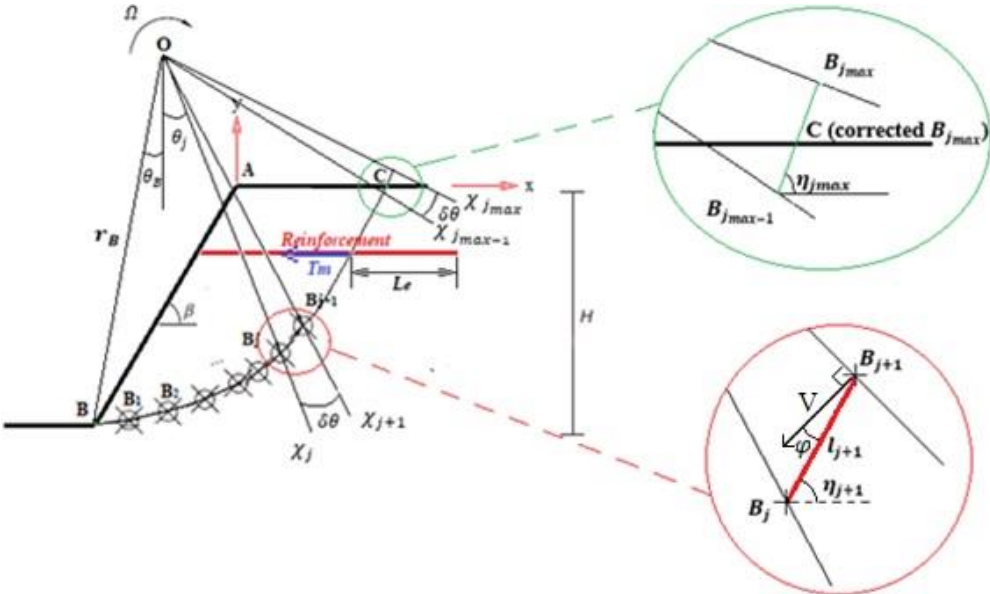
Discretization technique for the rotational failure surface of a reinforced soil retaining wall
